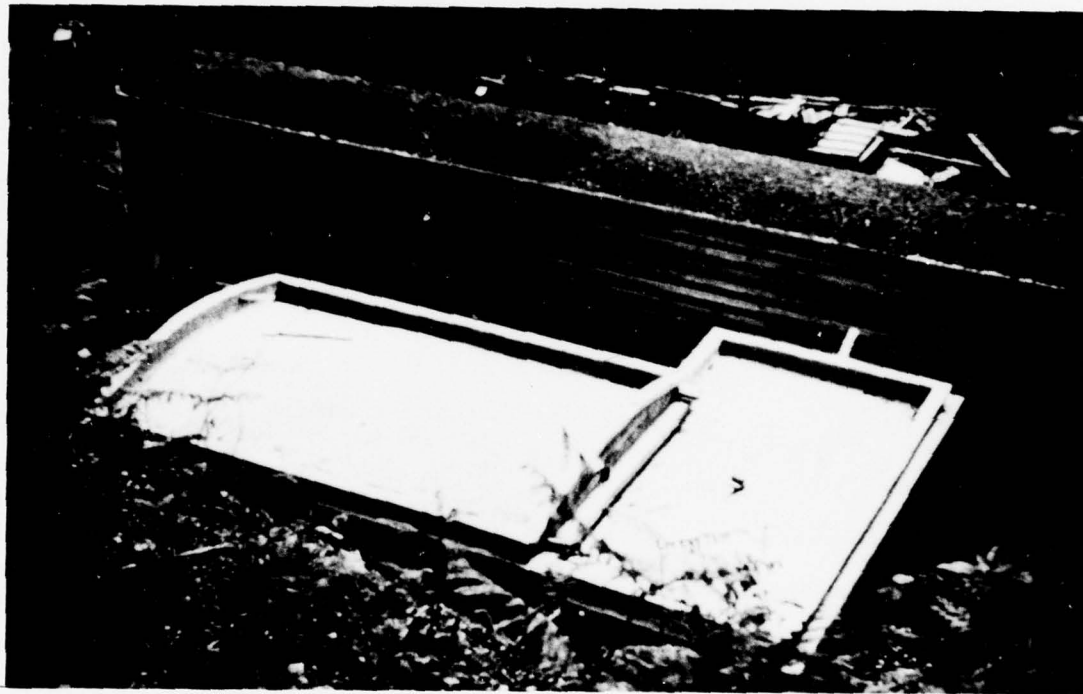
Completed View of Protective Barrier, Rio Tinto Facility
